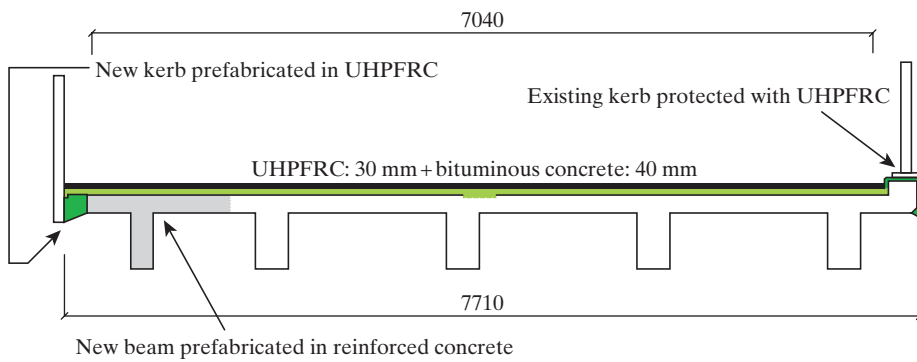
Bridge cross section after rehabilitation (Units: mm)
